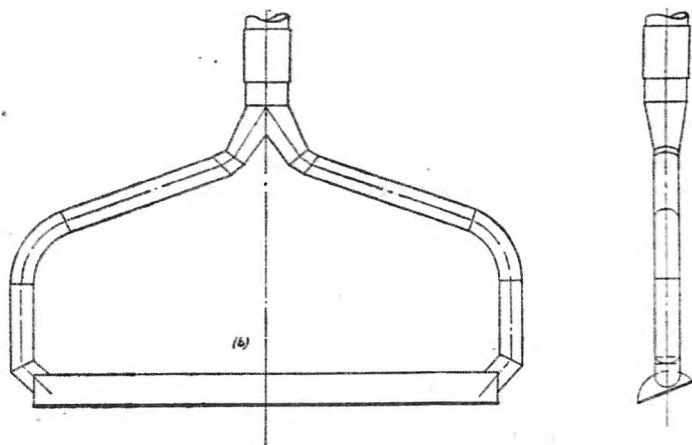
EXHAUST FOR CARDING MACHINE.
